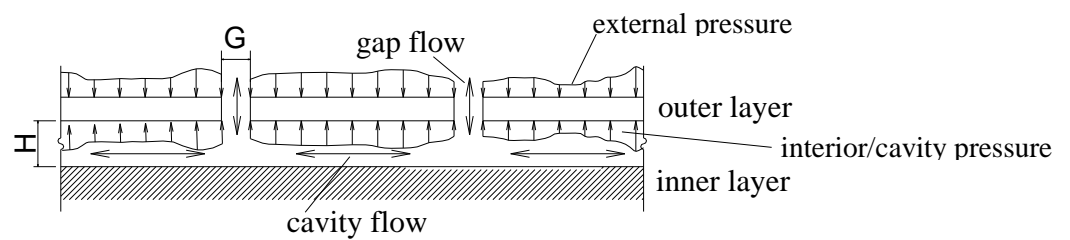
Section view of double-layer system and sketch of pressure equalization.
